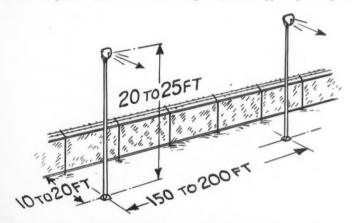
In This Drawing and the Next Five, Several Systems for the Protective Lighting of Factory Fences are Presented. This Drawing Shows α Highly Effective Method
